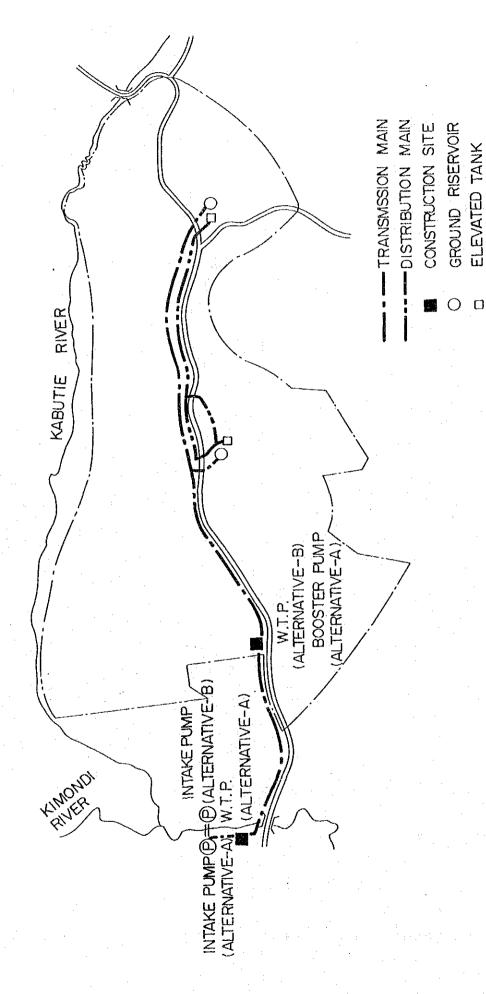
General Plan of Proposed Water Supply System Alternatives
